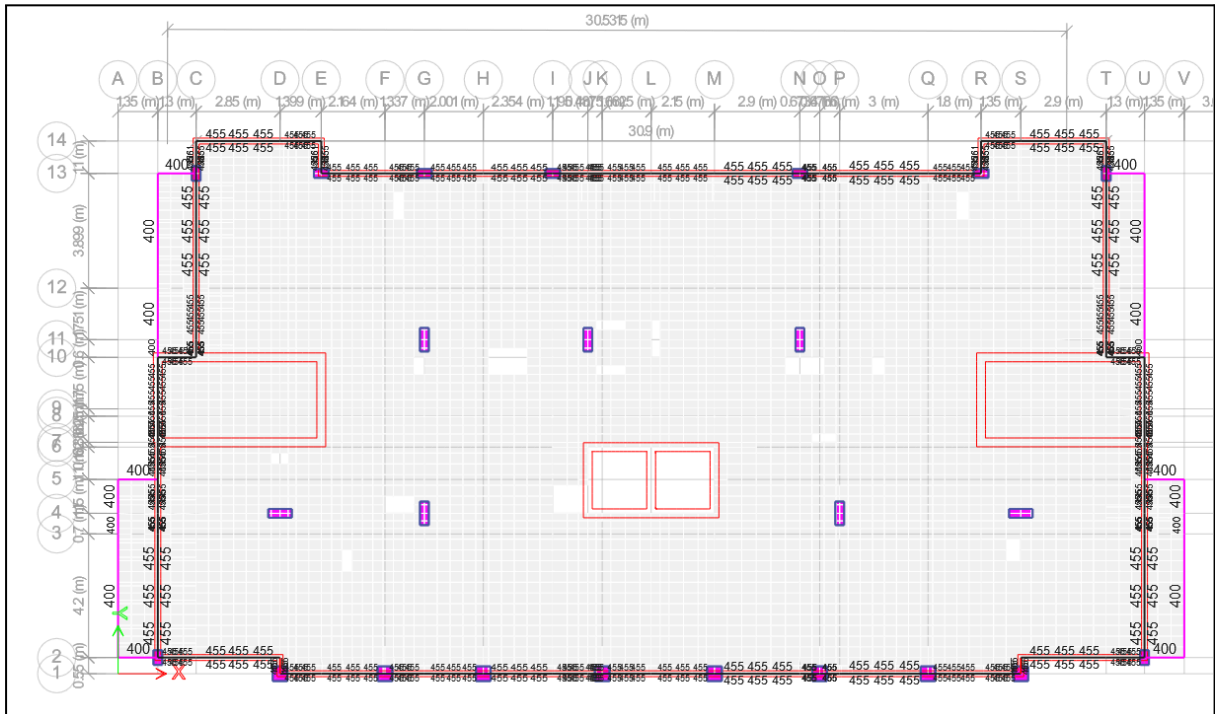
Longitudinal Reinforcement in wall-supported beams
